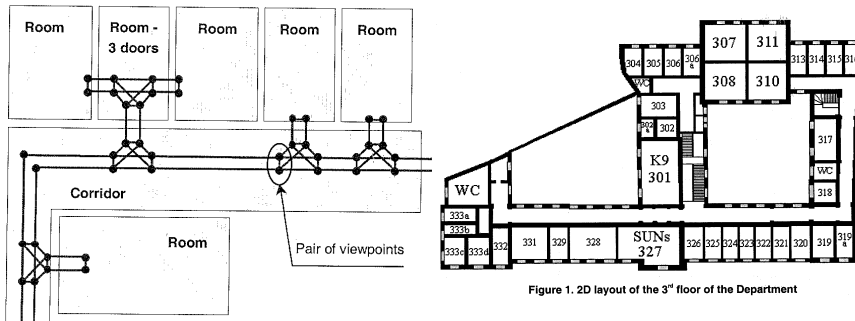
2D layout of the 3<sup>rd</sup> floor of the Department
